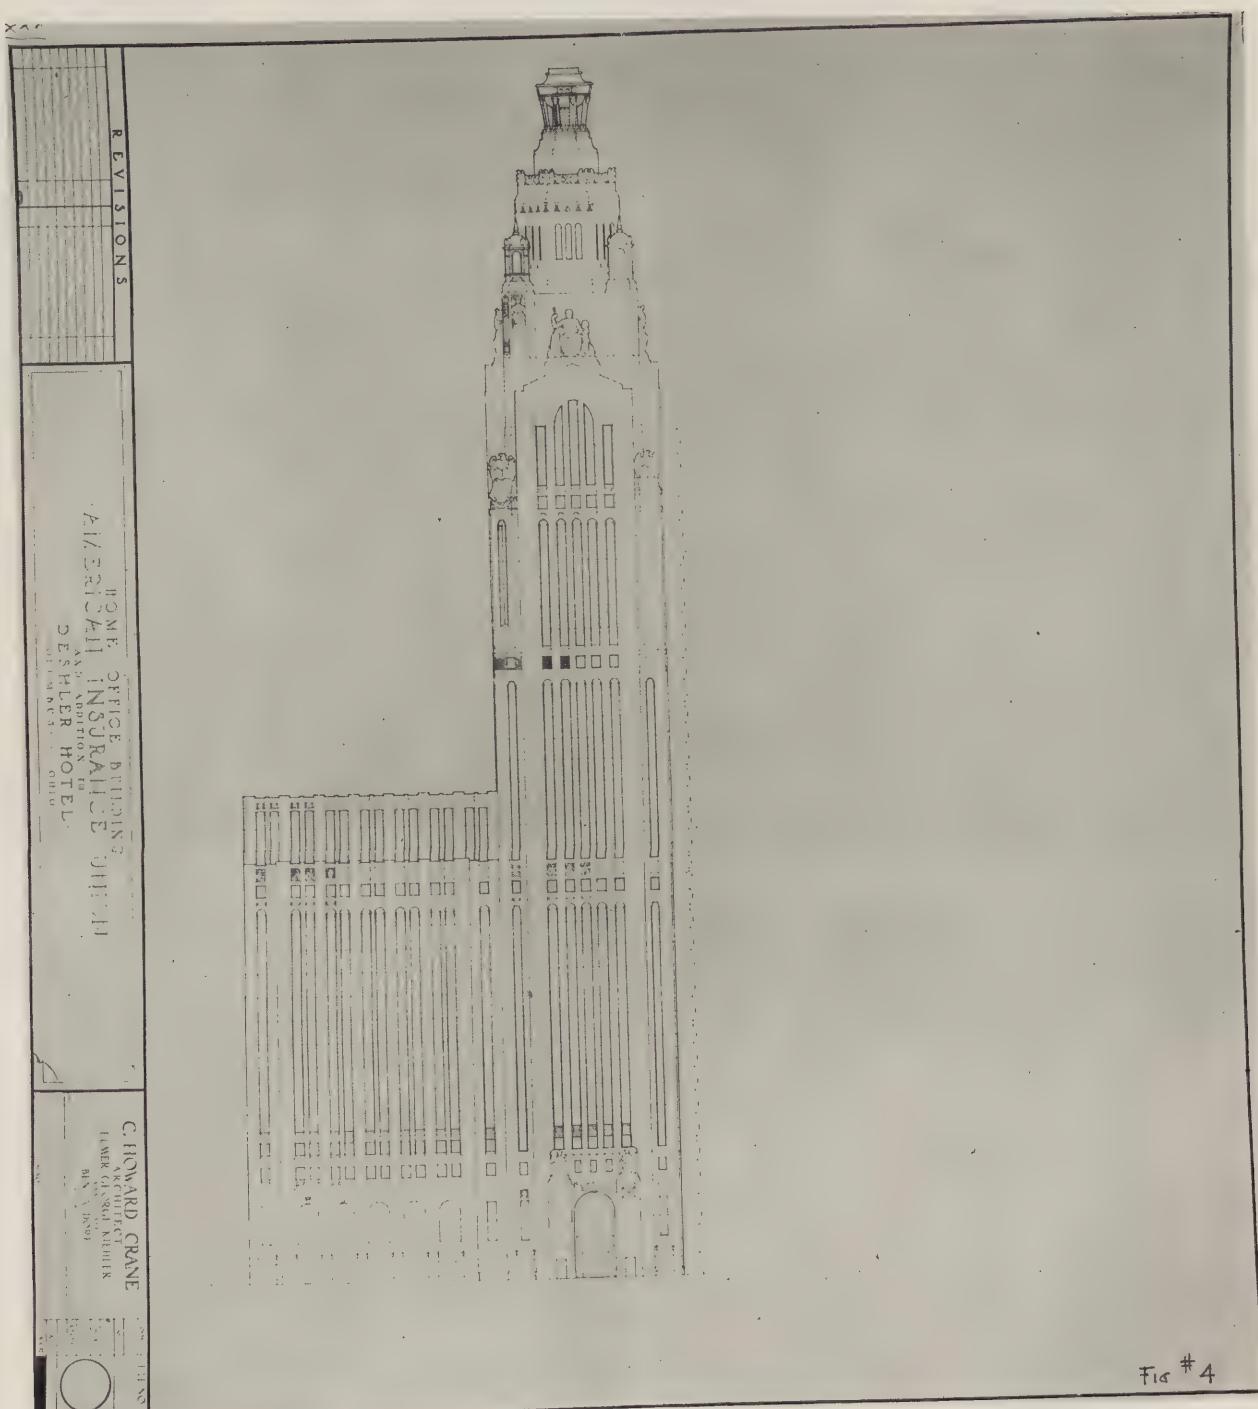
Working Drawing Elevation for Building Shown in Views of Model on page 78 and 79.
